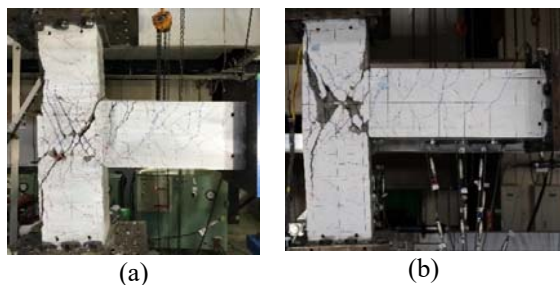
State of beam-column joint at failure at 5% drift, (a) T12-20T6C2; (b) F12-20T6C2.
